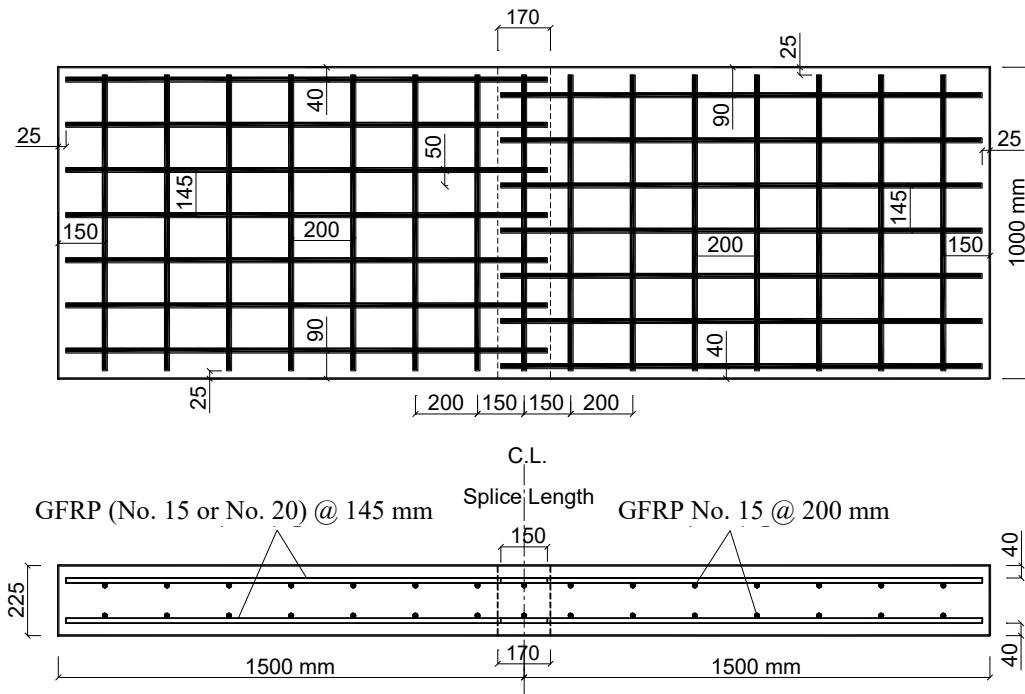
Concrete dimensions and reinforcement details of specimens G-150-15-B and G-150-20-B
